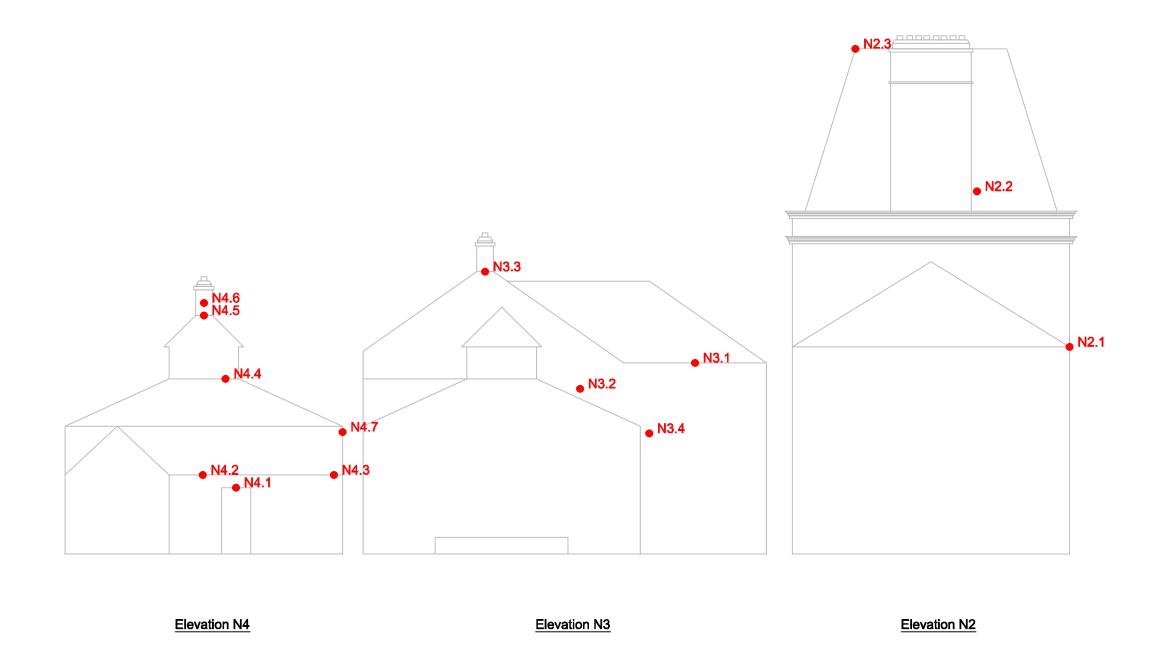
Elevation N2, N3, N4 of Station Hotel Building showing Defect/Observation Locations
